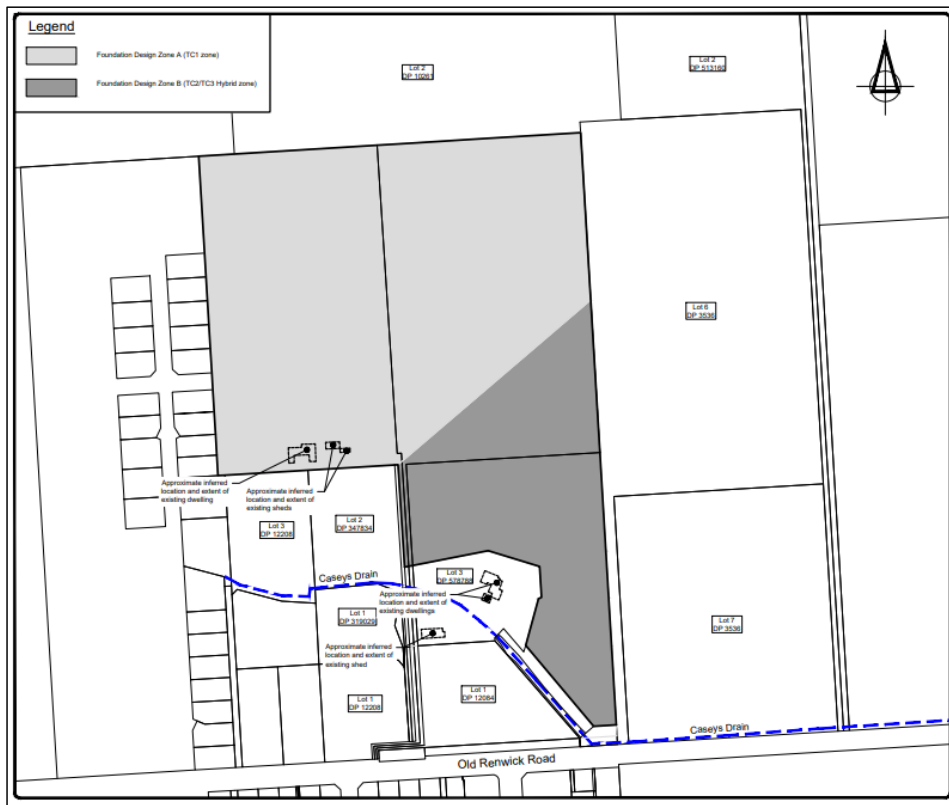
Foundation Design Zone A and B (Source: Geotechnical Investigation Report, September 2022)
